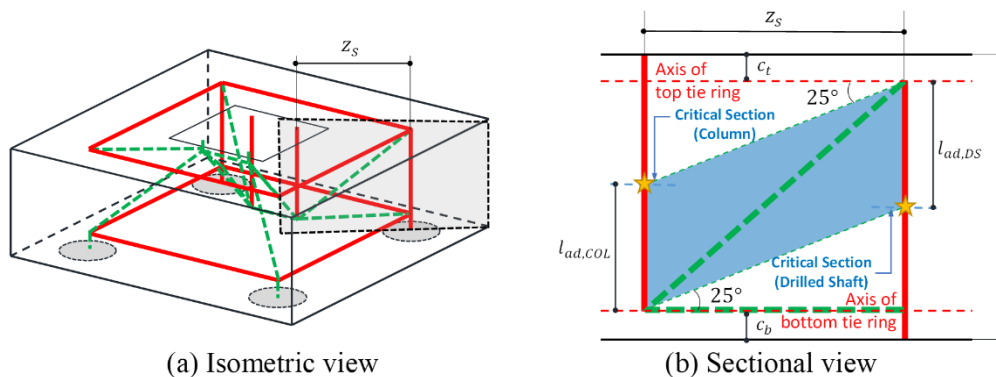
Proposed available lengths for anchorage of drilled shaft and column reinforcement in drilled shaft footings (Phase III)
